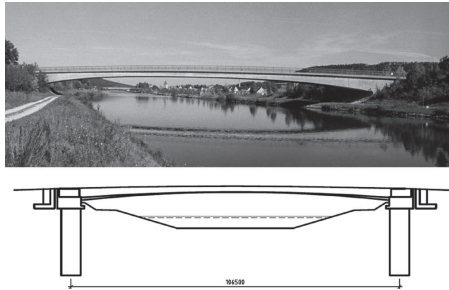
Southern Viaduct Berching, Germany (picture and longitudinal section by SSF Ingenieure, Germany, with permission)
